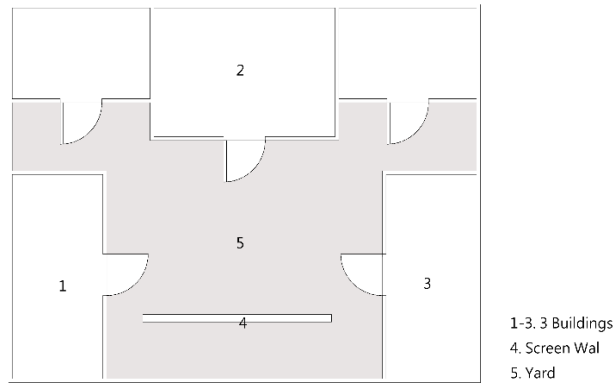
Plan of '3 Buildings and 1 Screen Wall
